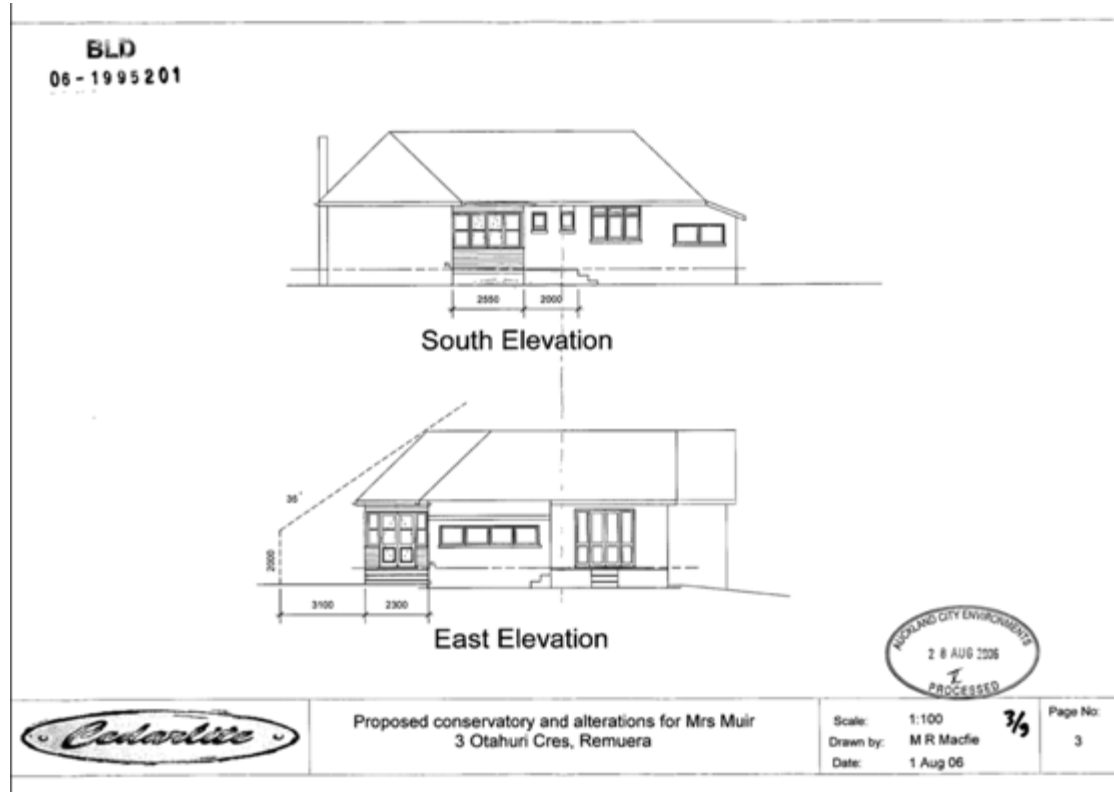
South and east elevations of the subject building in 2006, showing the proposed conservatory (Auckland Council property records).
